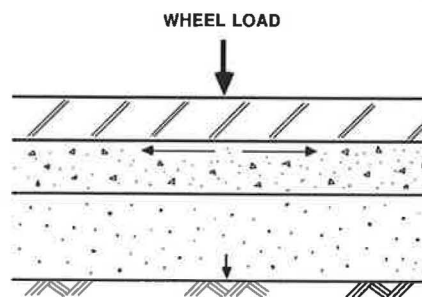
Subgrade deformation and AC tensile strain criteria used for flexible pavement design.
